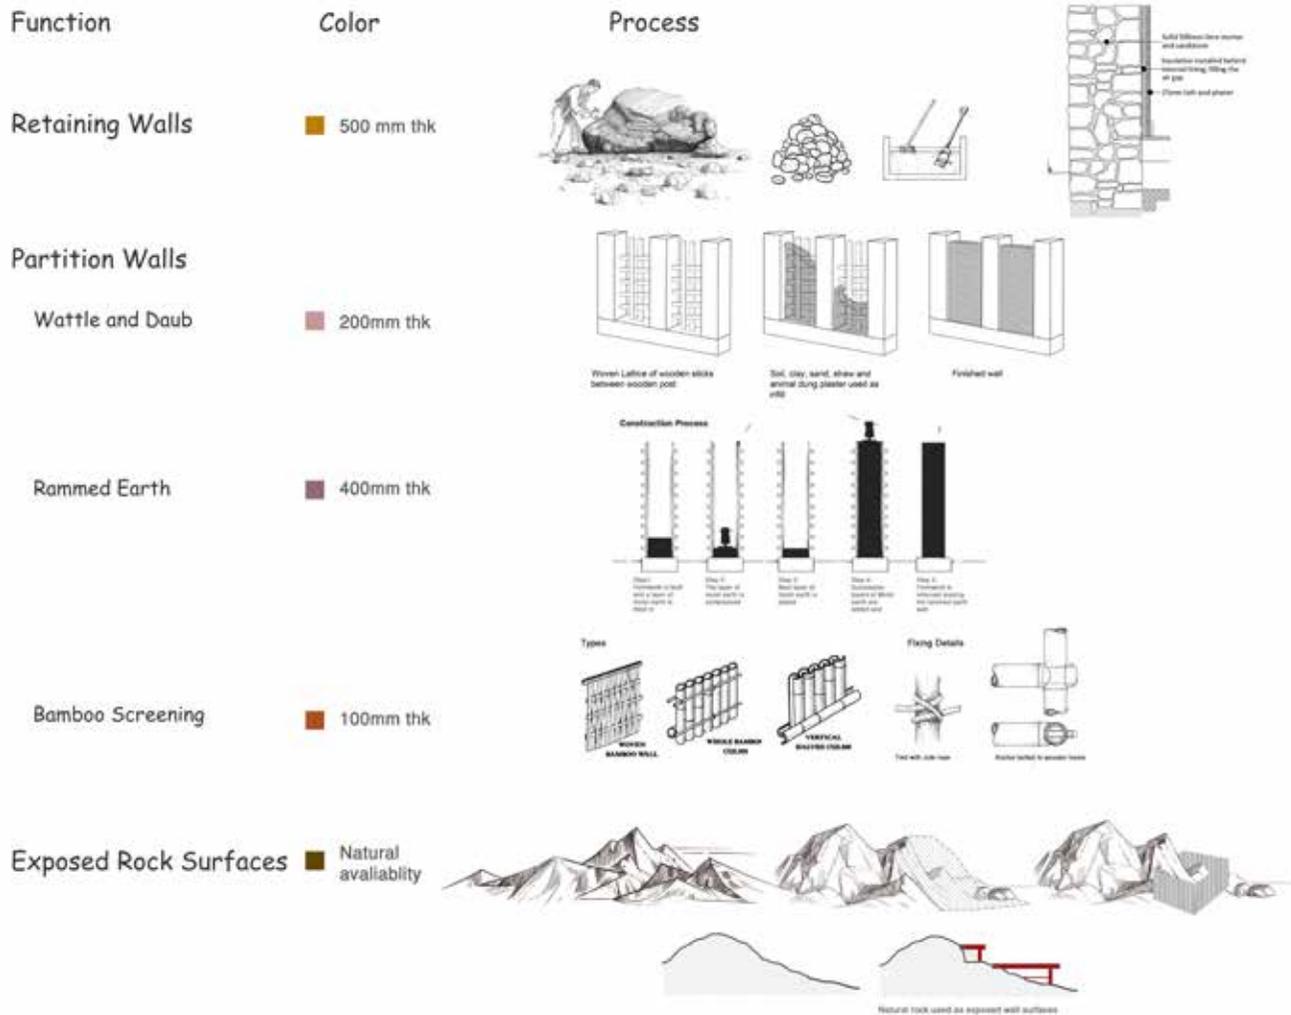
Construction Strategy developed for Design Intervention (Source: Author)
